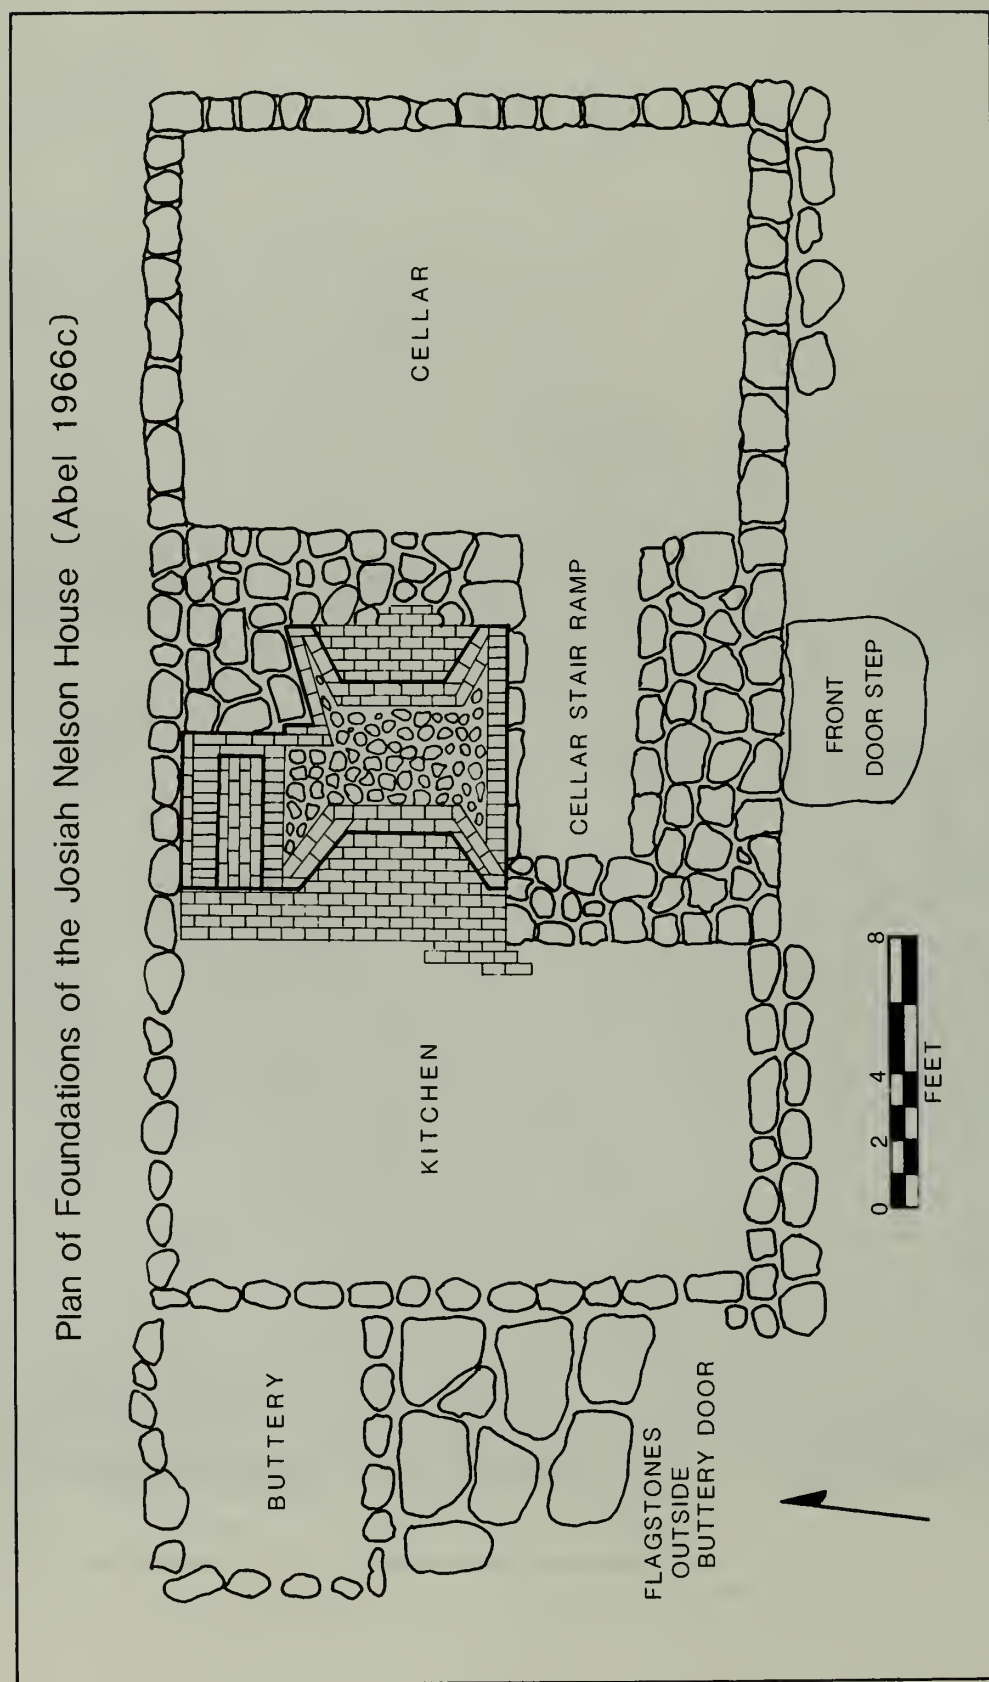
Abel's diagram of the plan of the foundations of the Josiah Nelson house (1966c).
